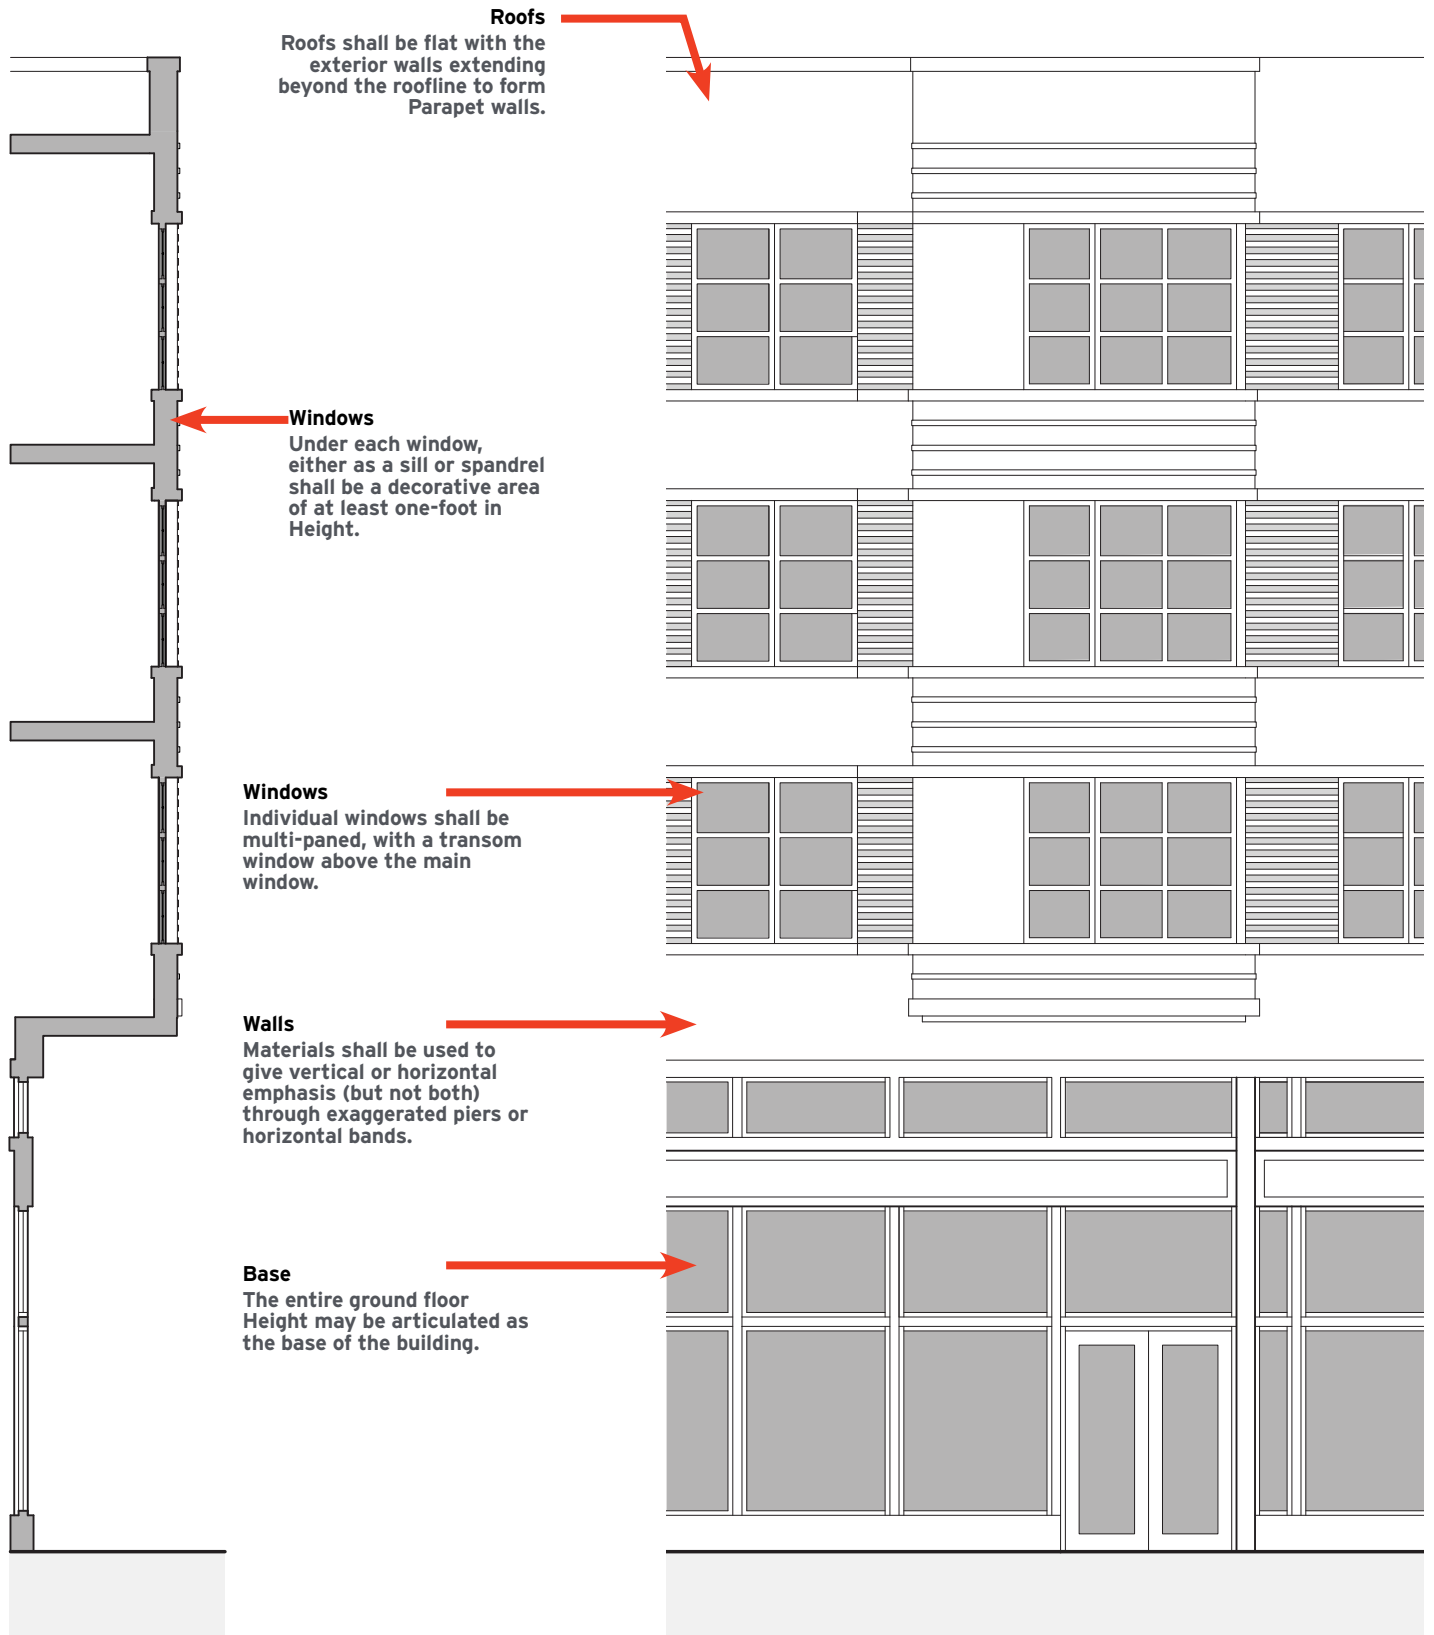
Art Deco Elements Diagram (Ground Floor Commercial)
